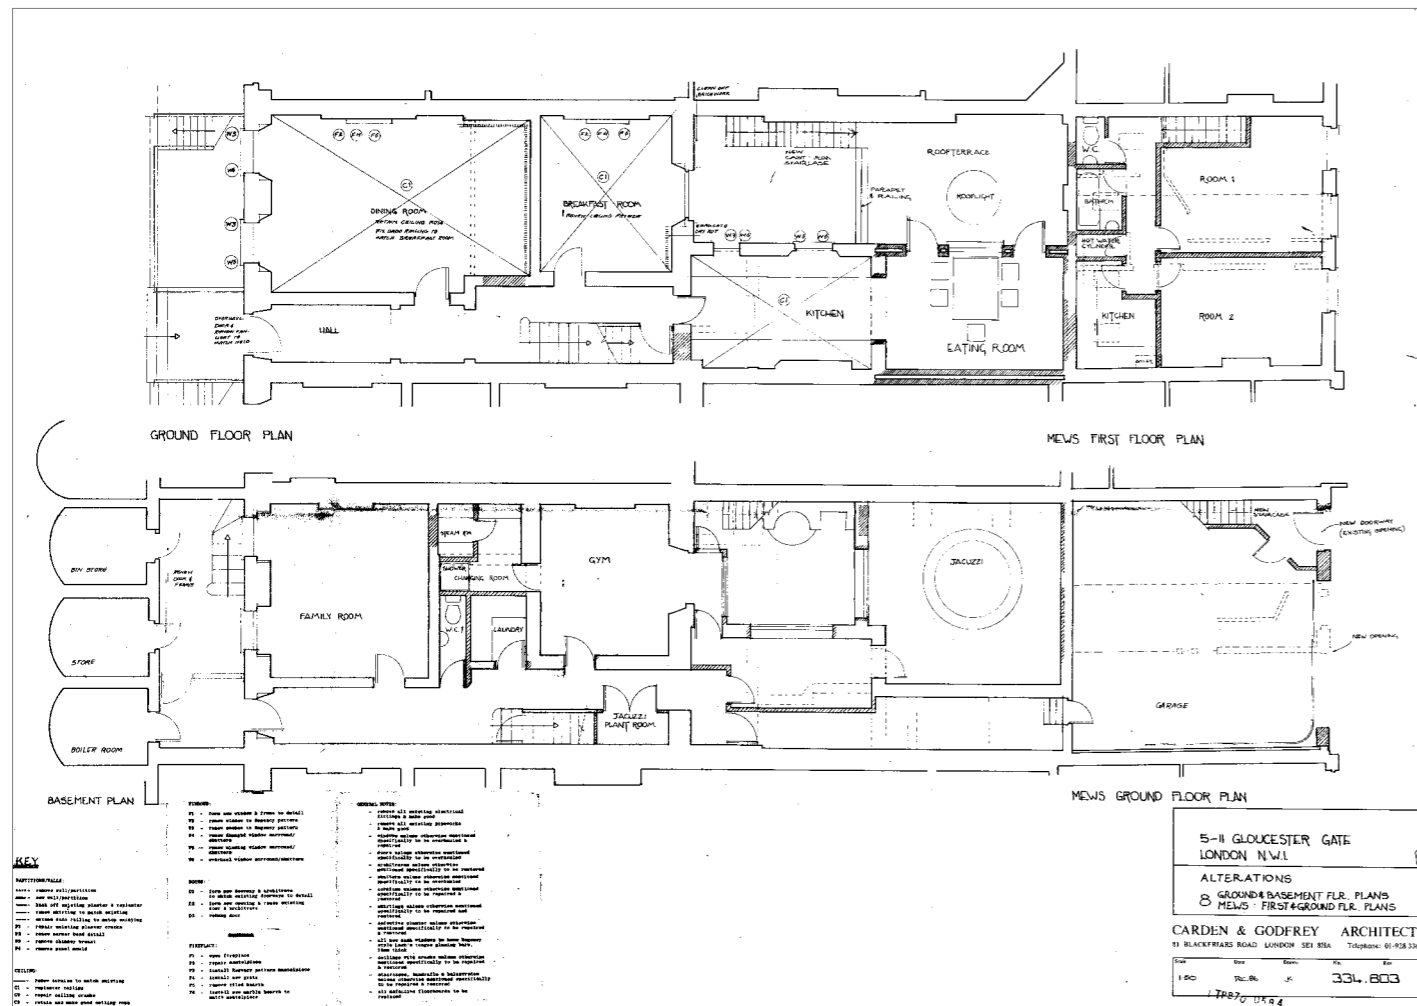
Consented plans for basement and ground floor at 8 Gloucester Gate, 1987.
